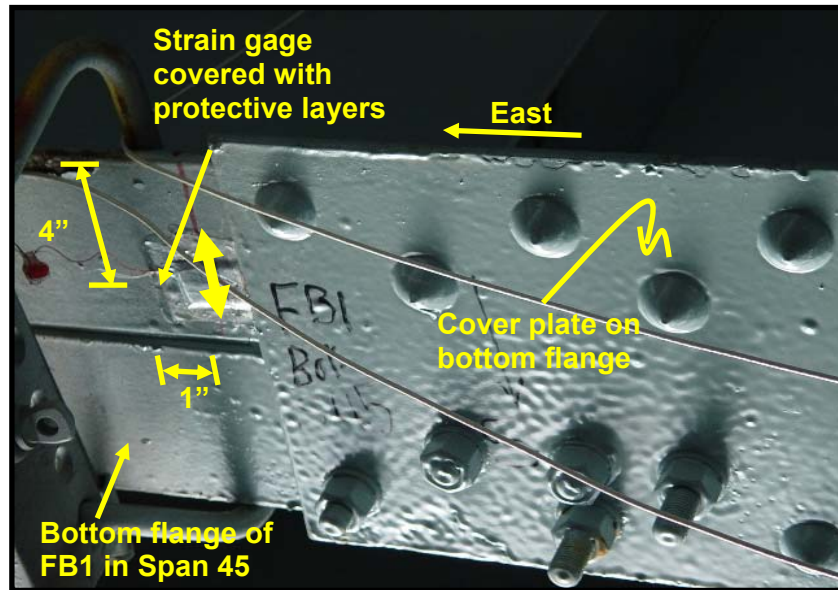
Strain gage FB1_Bot installed in Span 45 on the bottom face of the bottom flange of Floorbeam 1 at 9 ft-1 in east of the centerline of the floorbeam (i.e., on the reduced section of the floorbeam flange at 1 in from the termination of the cover plate riveted/bolted to the bottom flange) and 4 in from the edge of the flange.
